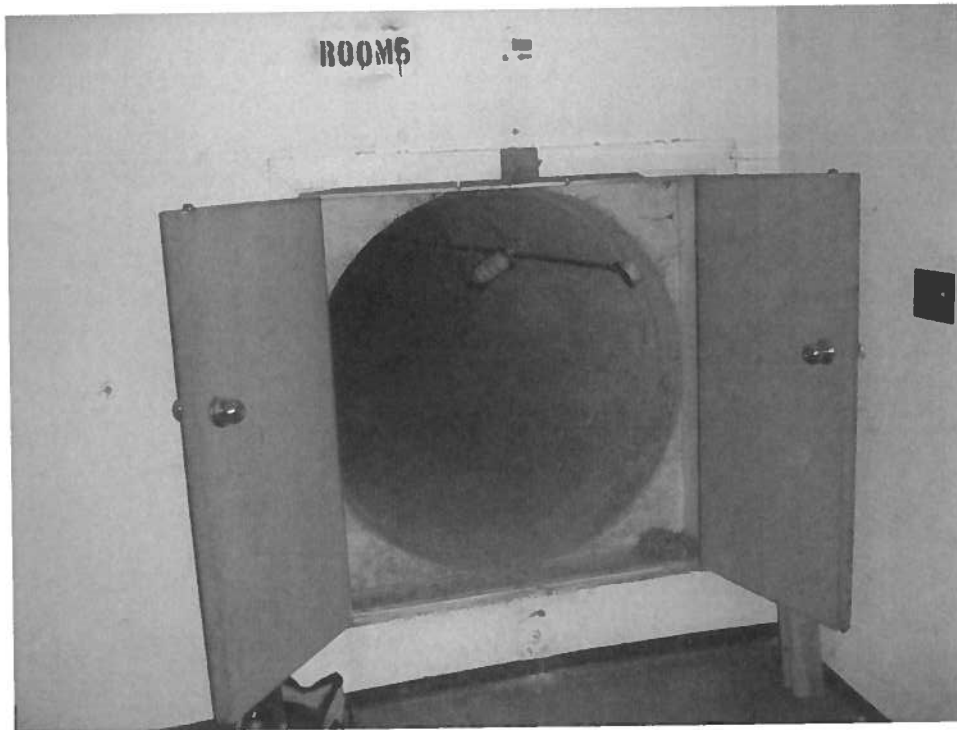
Double doors close off entrance to the escape tunnel, adjacent to the food distribution window in the fallout shelter. (Photo by Craig Holstine, WSDOT, 2010).
